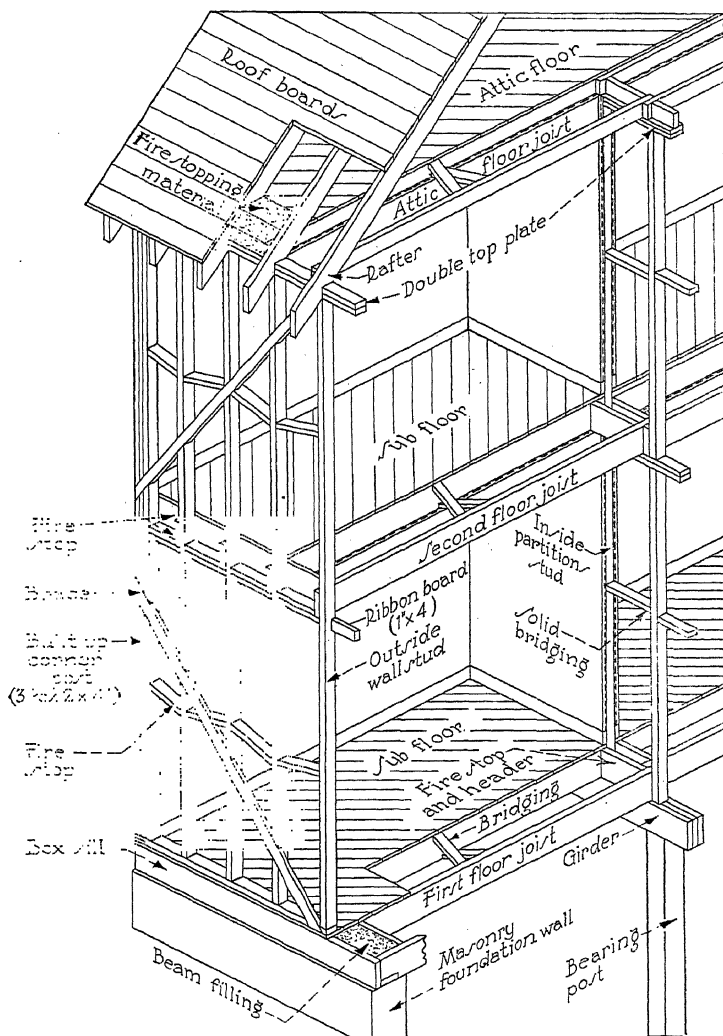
Approved details of balloon frame construction. (Courtesy of U. S. Bureau of Standards.)
